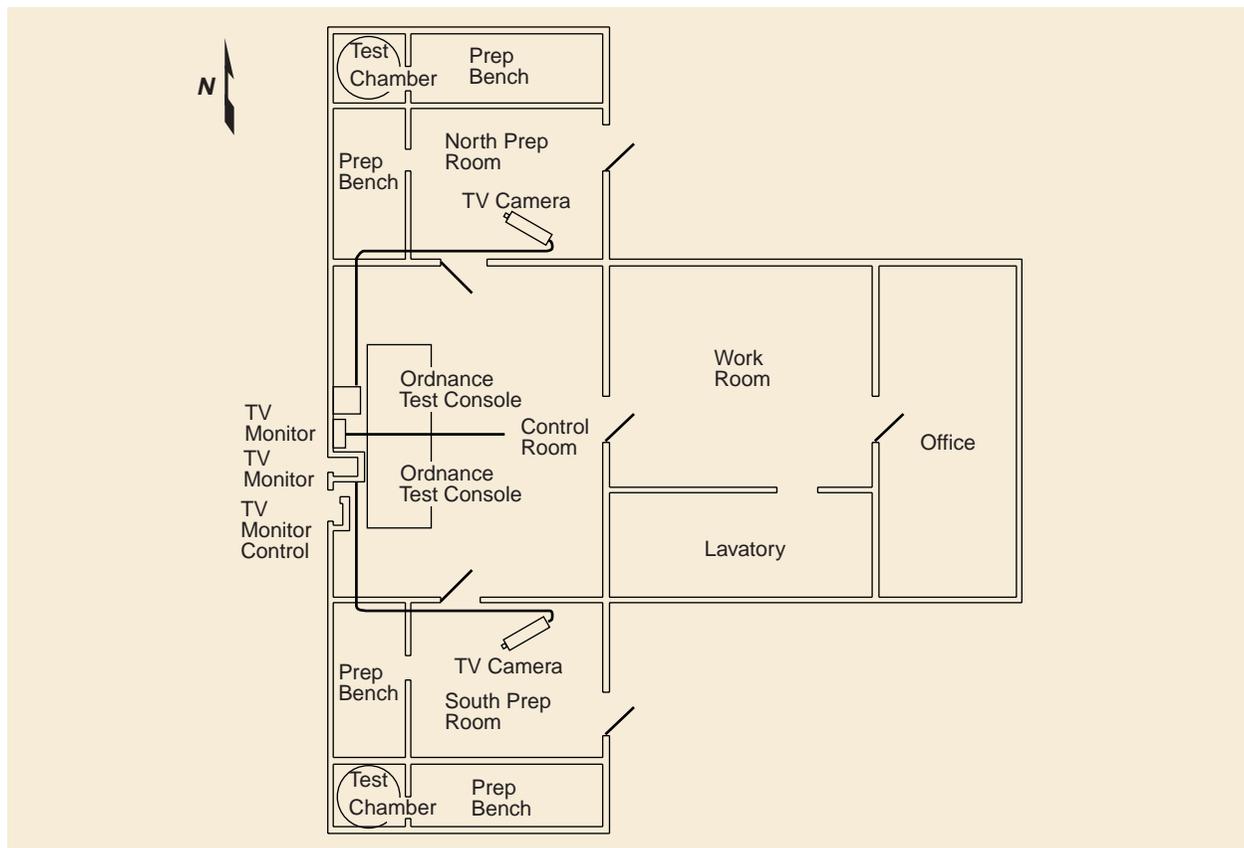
Electrical-Mechanical Testing Building Floor Plan
